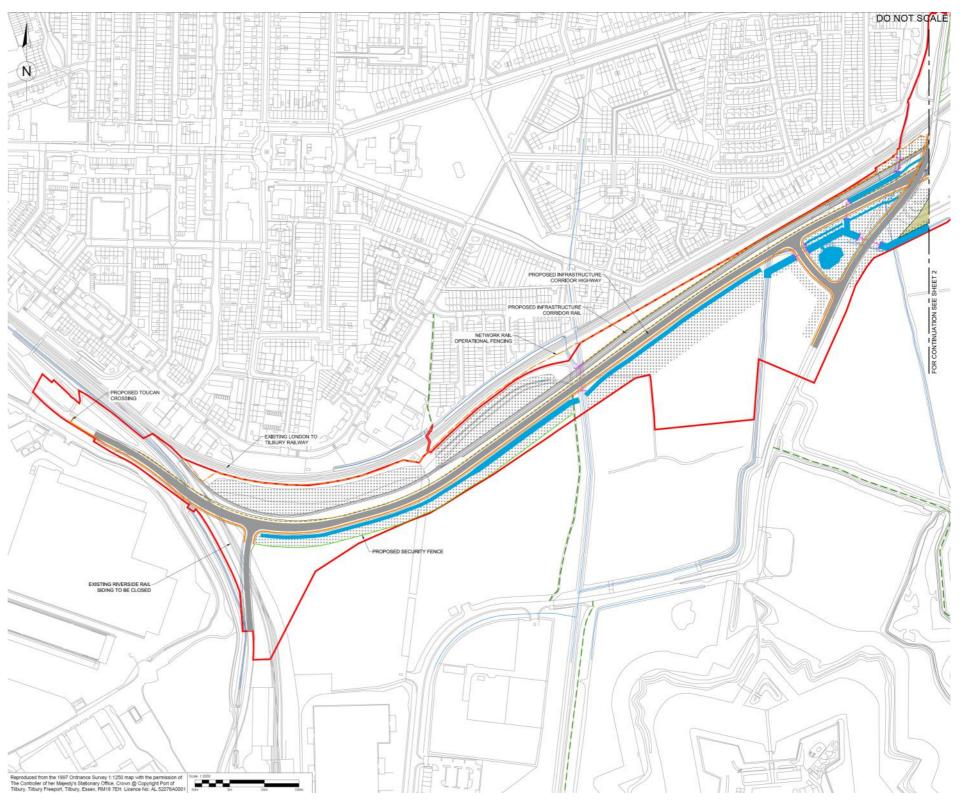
General Arrangement plan of the infrastructure corridor (Sheet 2 of 2) (Source: Atkins)
